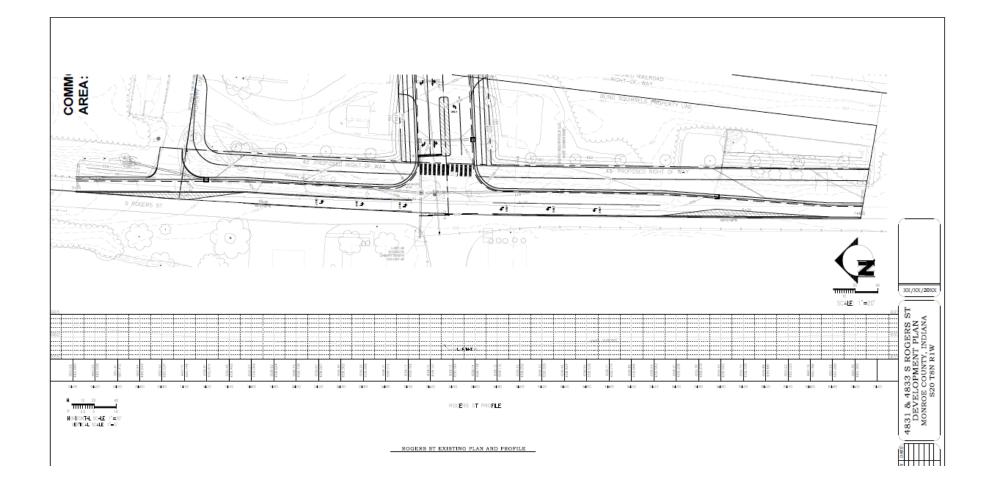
# EXHIBIT FIFTEEN: Draft Development Plan – W That Road
